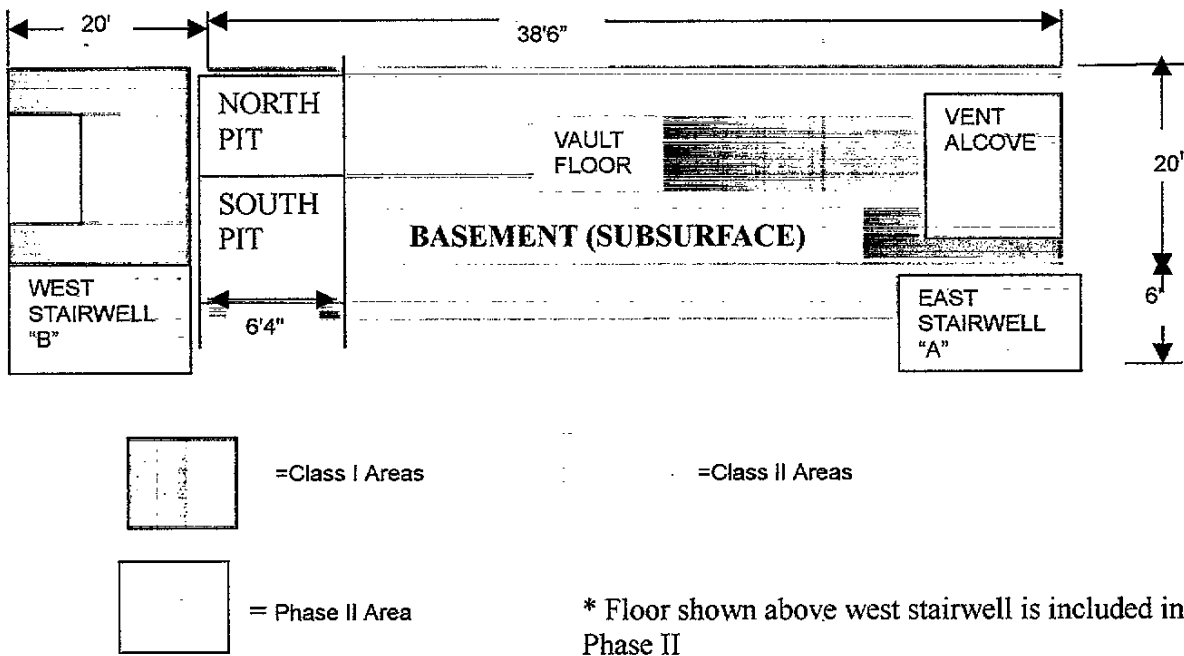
BUILDING 4059 CLASS I FLOOR PLAN (BASEMENT LEVEL)
